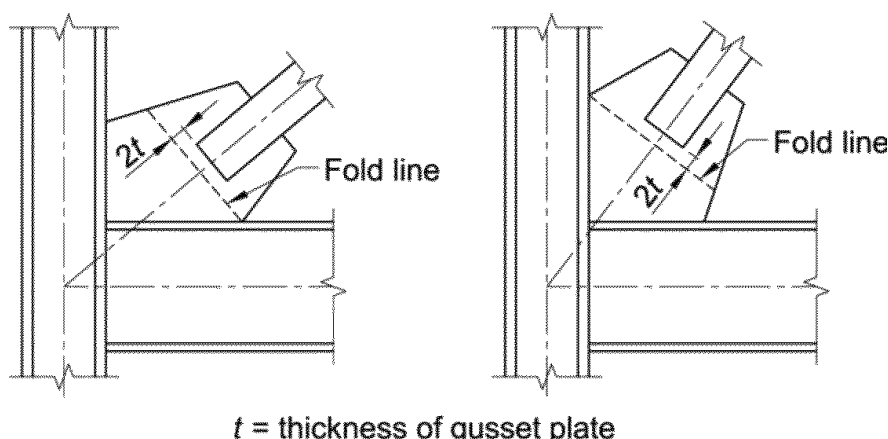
Brace-to-gusset plate requirement for buckling out-of-plane bracing system.
